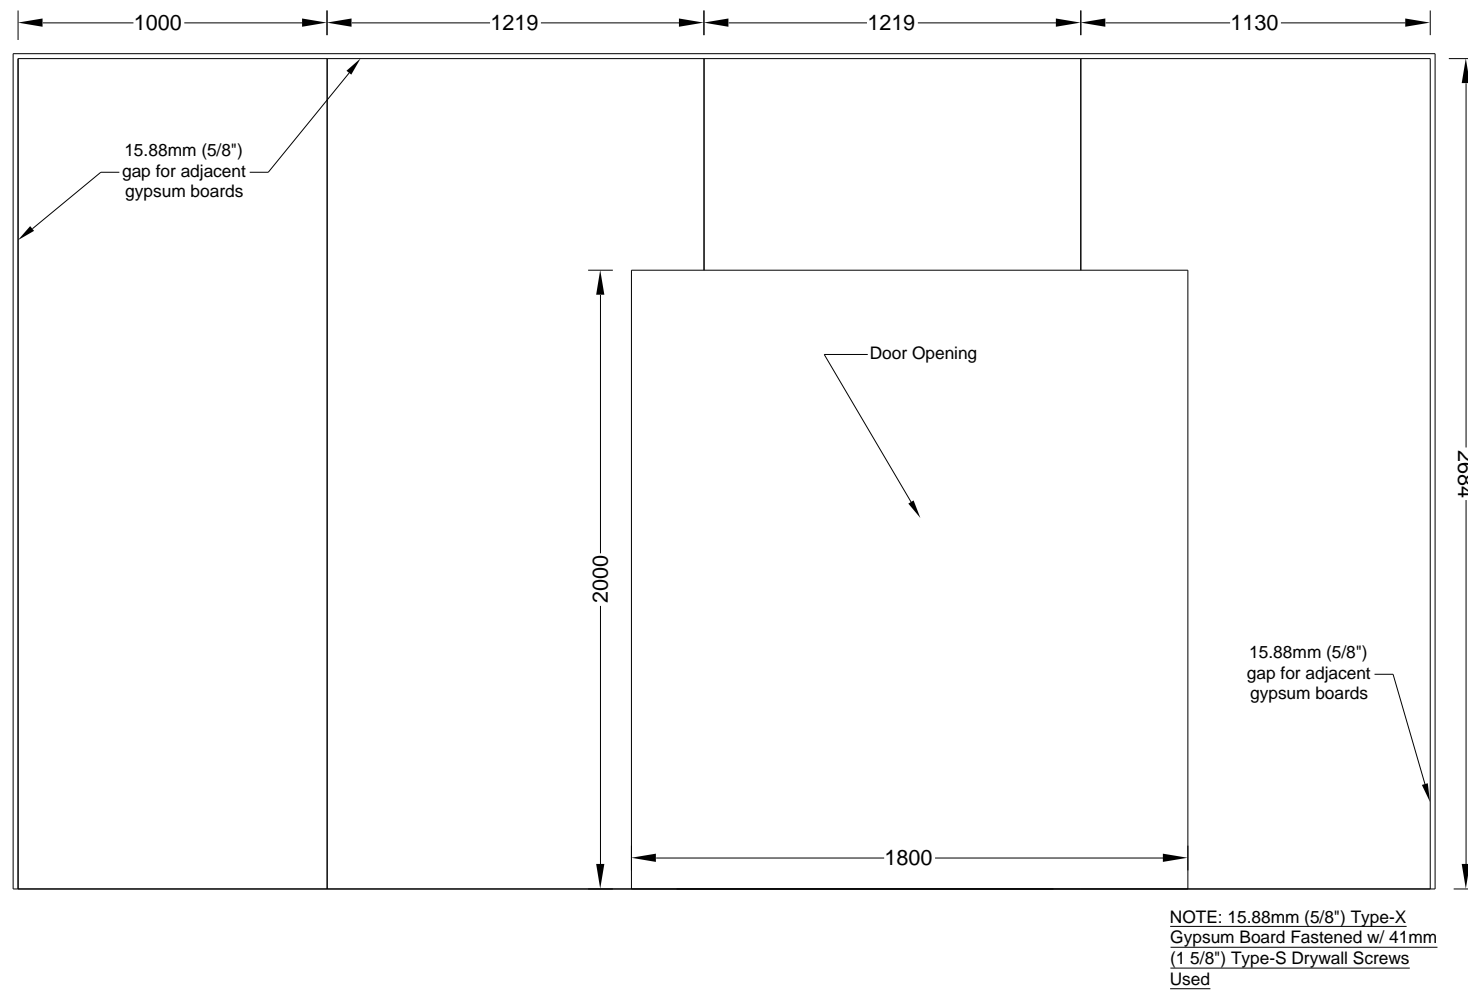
Test 1-3 Large Compartment CLT - Ceiling - Gypsum Layout - Middle Layer
